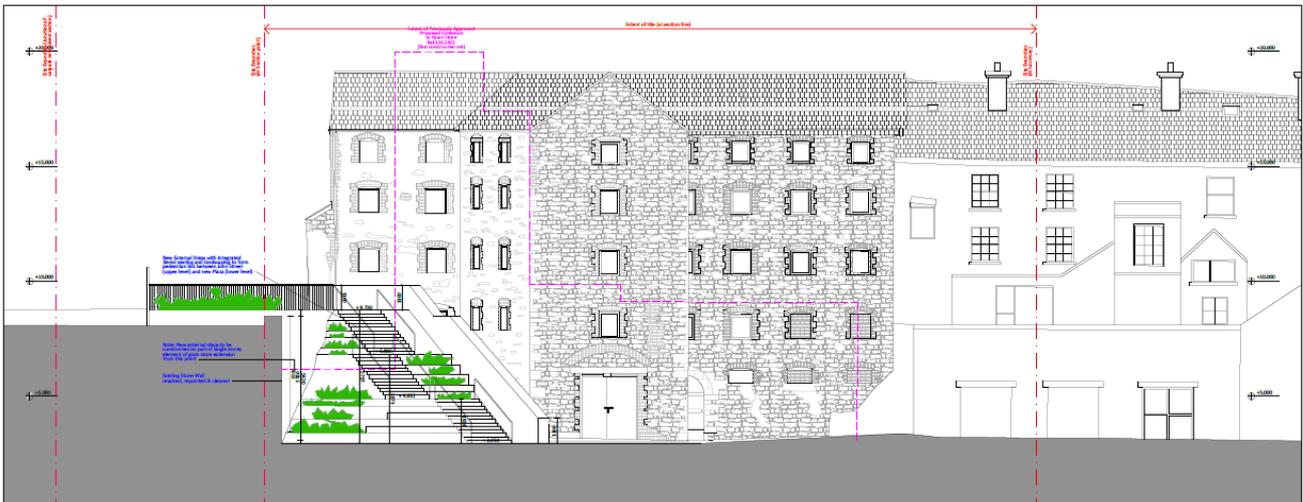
Elevation facing River Barrow (Source: ODKM Architects)
